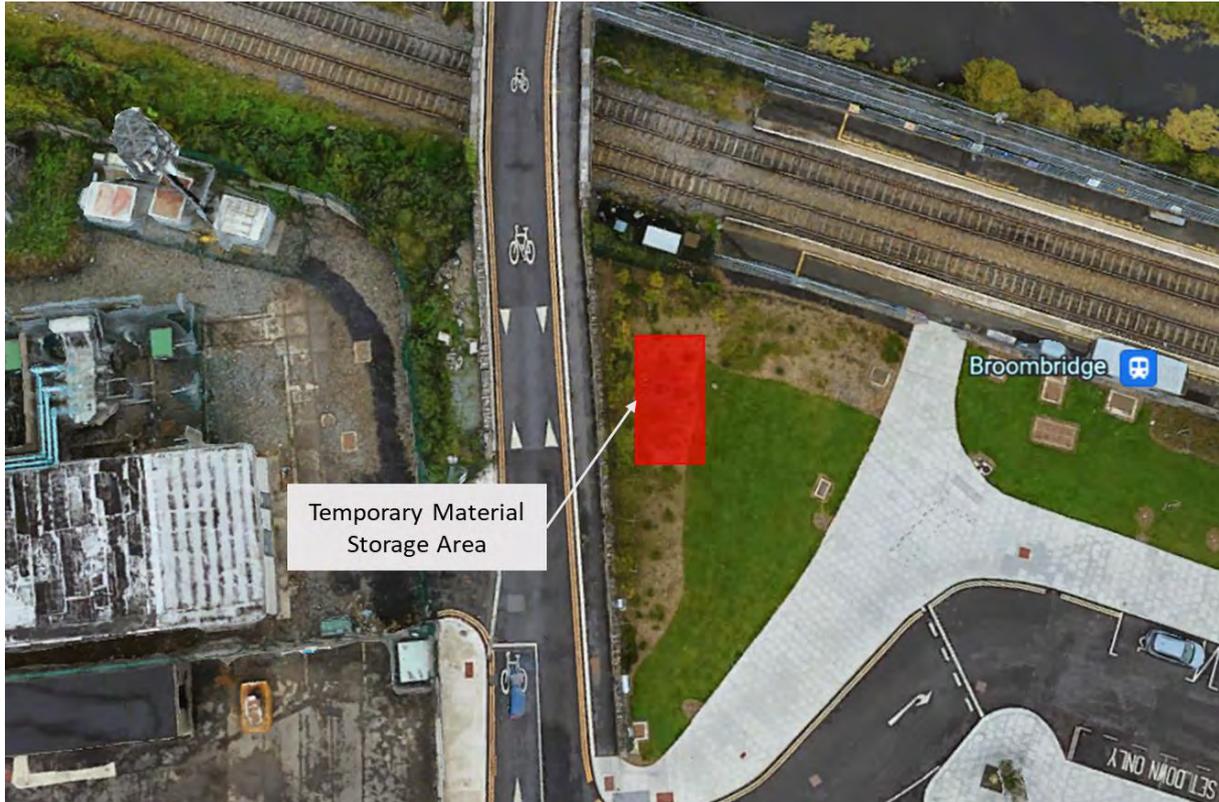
Plan of proposed temporary material storage area at OBG5
